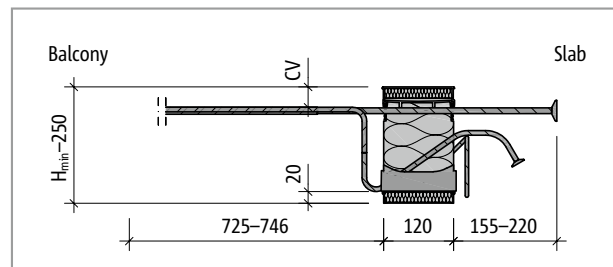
Schöck Isokorb® XT type K-U-M4: Product section
